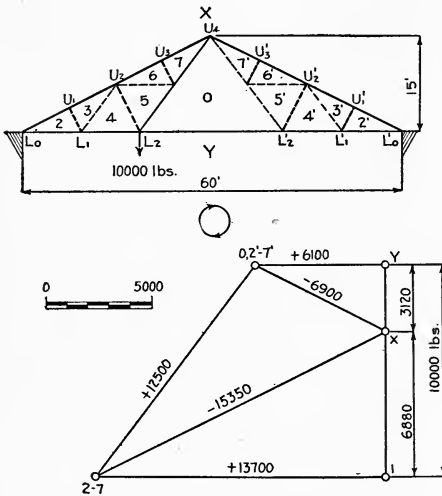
Fink Truss Loaded with 5-Ton Hoist; also Stress Diagram of Same.
